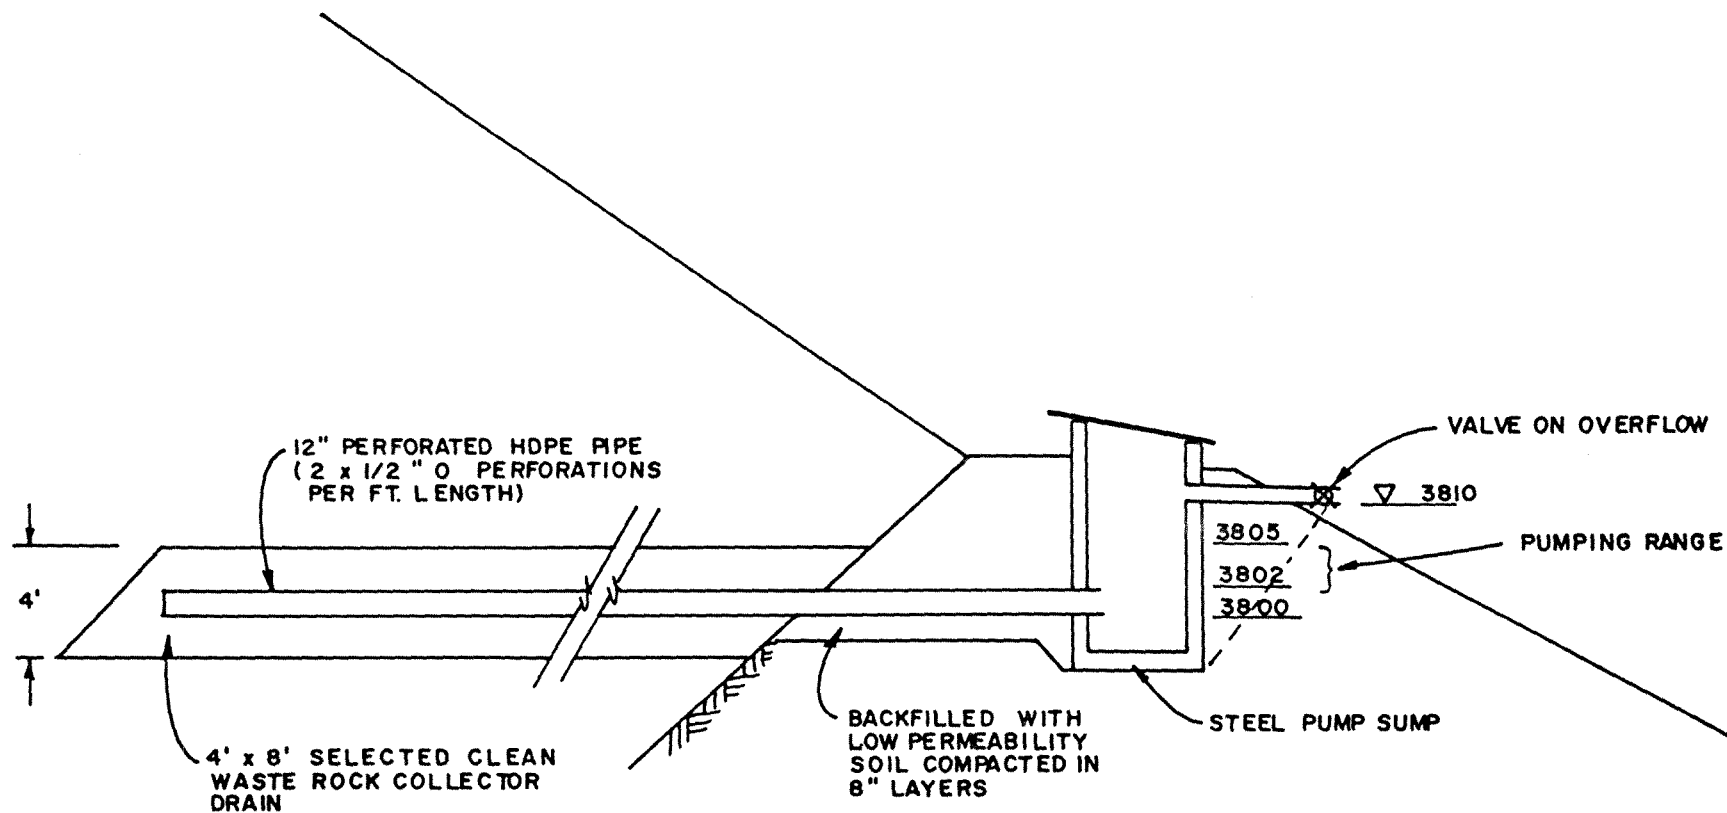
SECTION THROUGH ZONE TWO DEWATERING COLLECTOR
